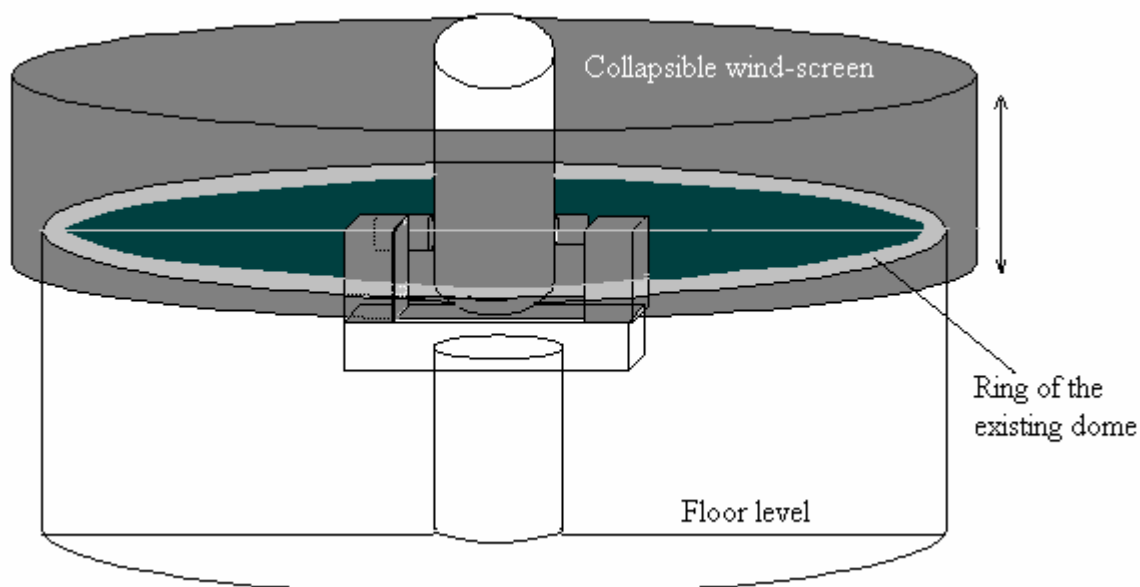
Top section of proposed modification of existing building. Existing dome will be replaced by a wall of variable height. The height of the wall will match the elevation of the telescope. In this way, the telescope will be protected from wind loading, at the same time thermal equalization will take place. A small retractable enclosure for the telescope will protect it from rains when not in use.
